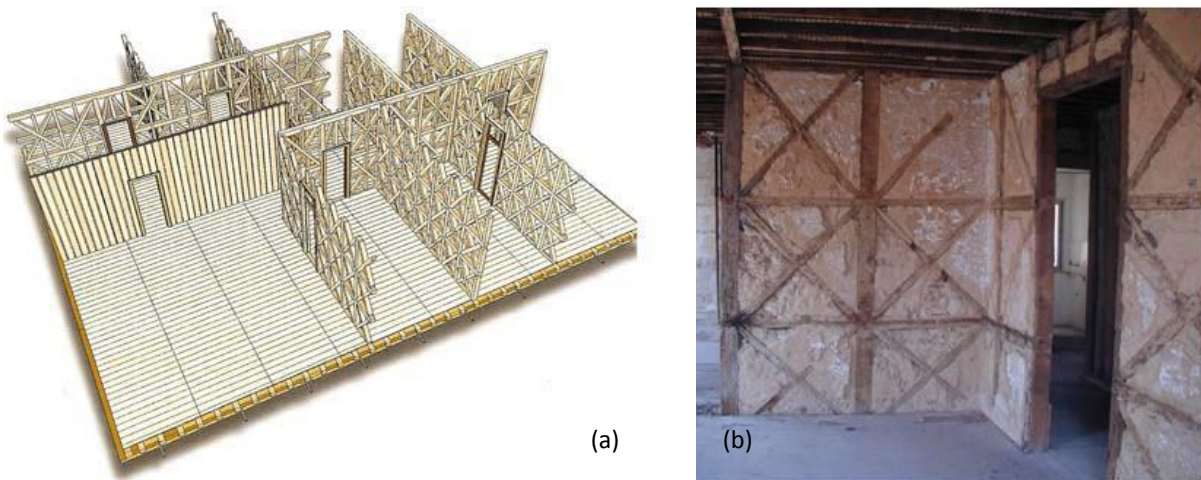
a) Details of the floors and walls (*gaiola*). b) *Santo André's Cross* (Appleton J. , 2003)
